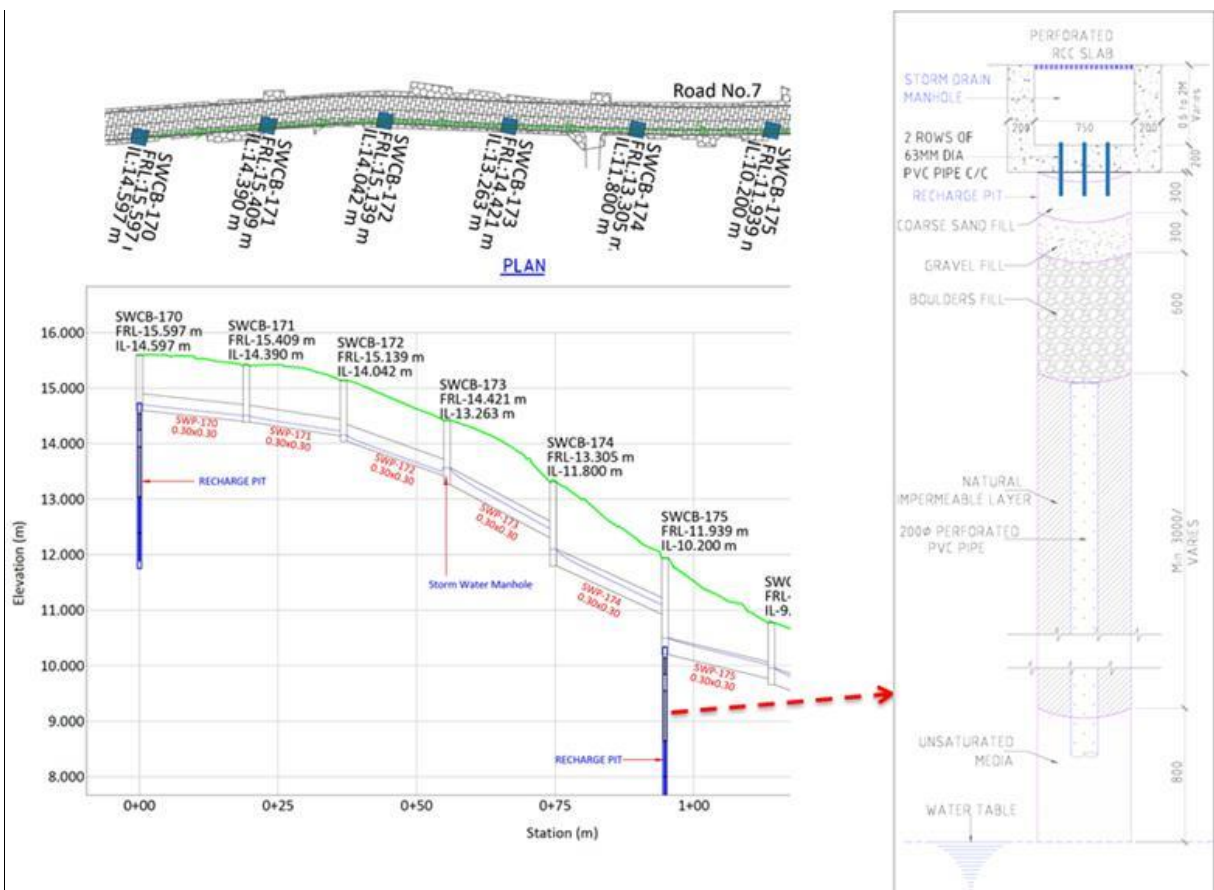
Illustrative Plan-Profile showing arrangement of Rainwater Recharge Pits and Typical C/S of Recharge Pit
